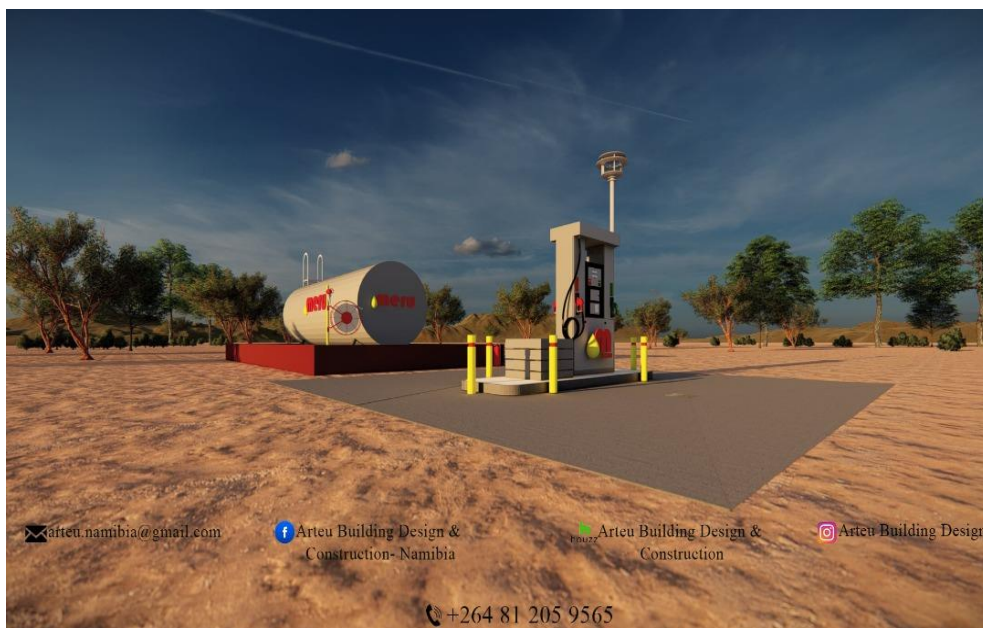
Concept layout of project ERF showing location of Above ground and related facilities, courtesy of
